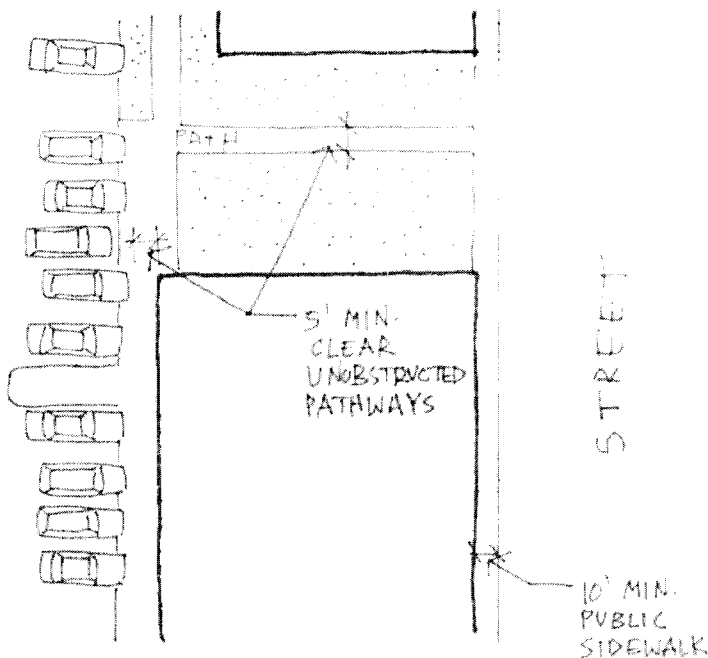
5-Foot Unobstructed On-Site Pedestrian Pathways
